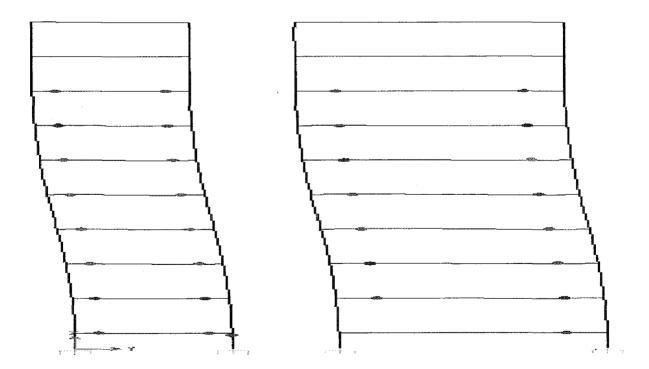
Yield Pattern at Ultimate Point for 9-Storey Building Designed as OMRF in Transverse Direction
